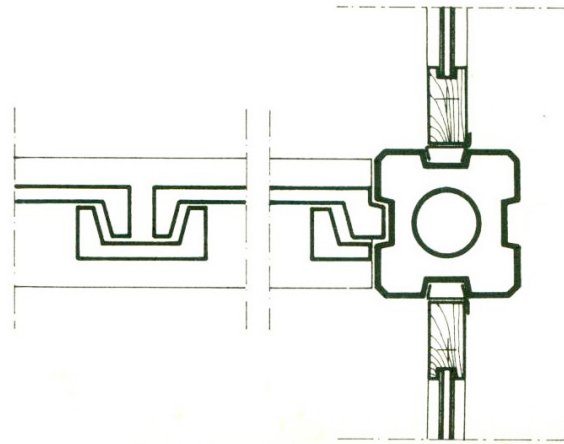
Abadiânia's prefabricated column in *argamassa armada* and its connections with precast panels and standardized wooden door frames. João Filgueiras Lima. *Escola Transitória: modelo rural*. Brasília: MEC/CEDATE, 1984, p. 110
